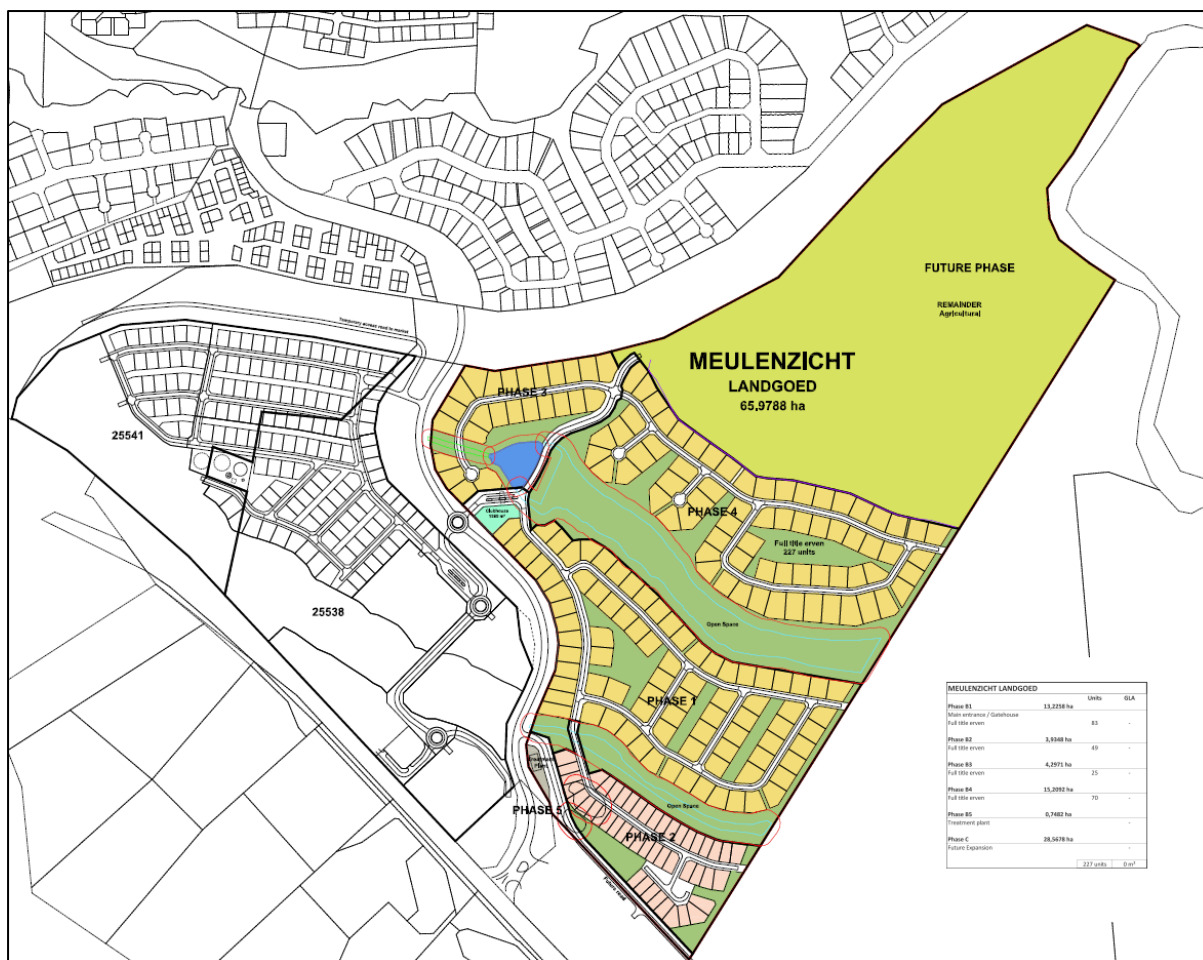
The latest site development plan (SDP) for Meulenzicht Landgoed.
